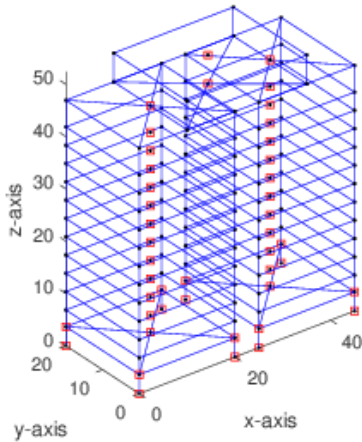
3D model of Building units A & B and the base-isolated steel structure. The distance between the buildings was employed for modelling purposes and does not reflect the actual width of the expansion joint incorporated in connecting impact-springs
